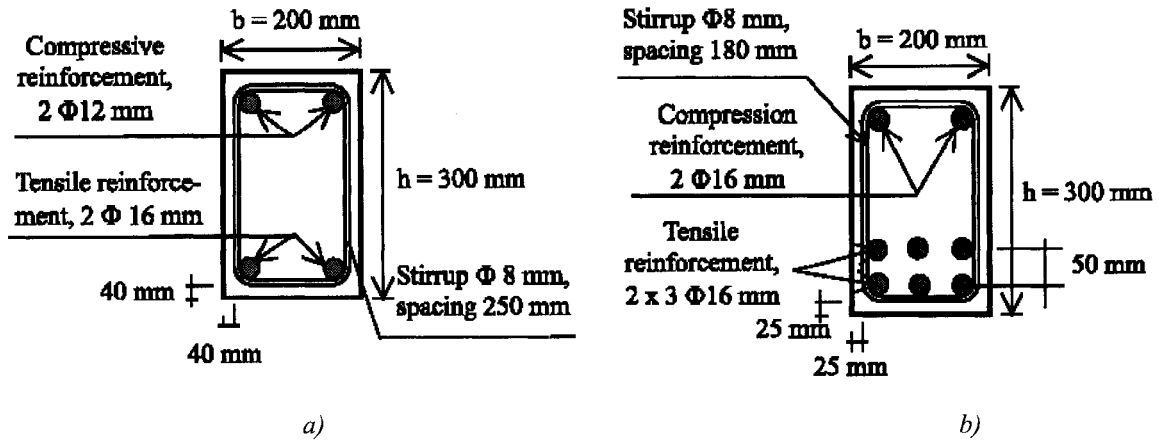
Details of Beam Reinforcement Configuration (a) for Housing Applications; (b) for Civil Engineering Applications (Zhu et al., 2001)
